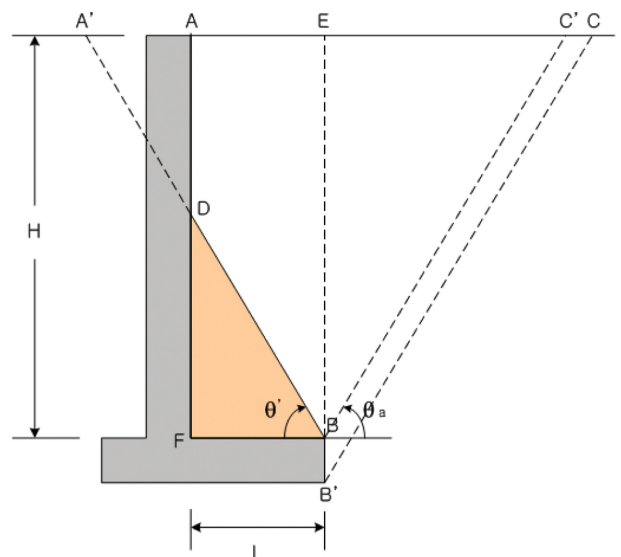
Failure of cohesionless soil behind cantilever retaining wall with the short heel.
